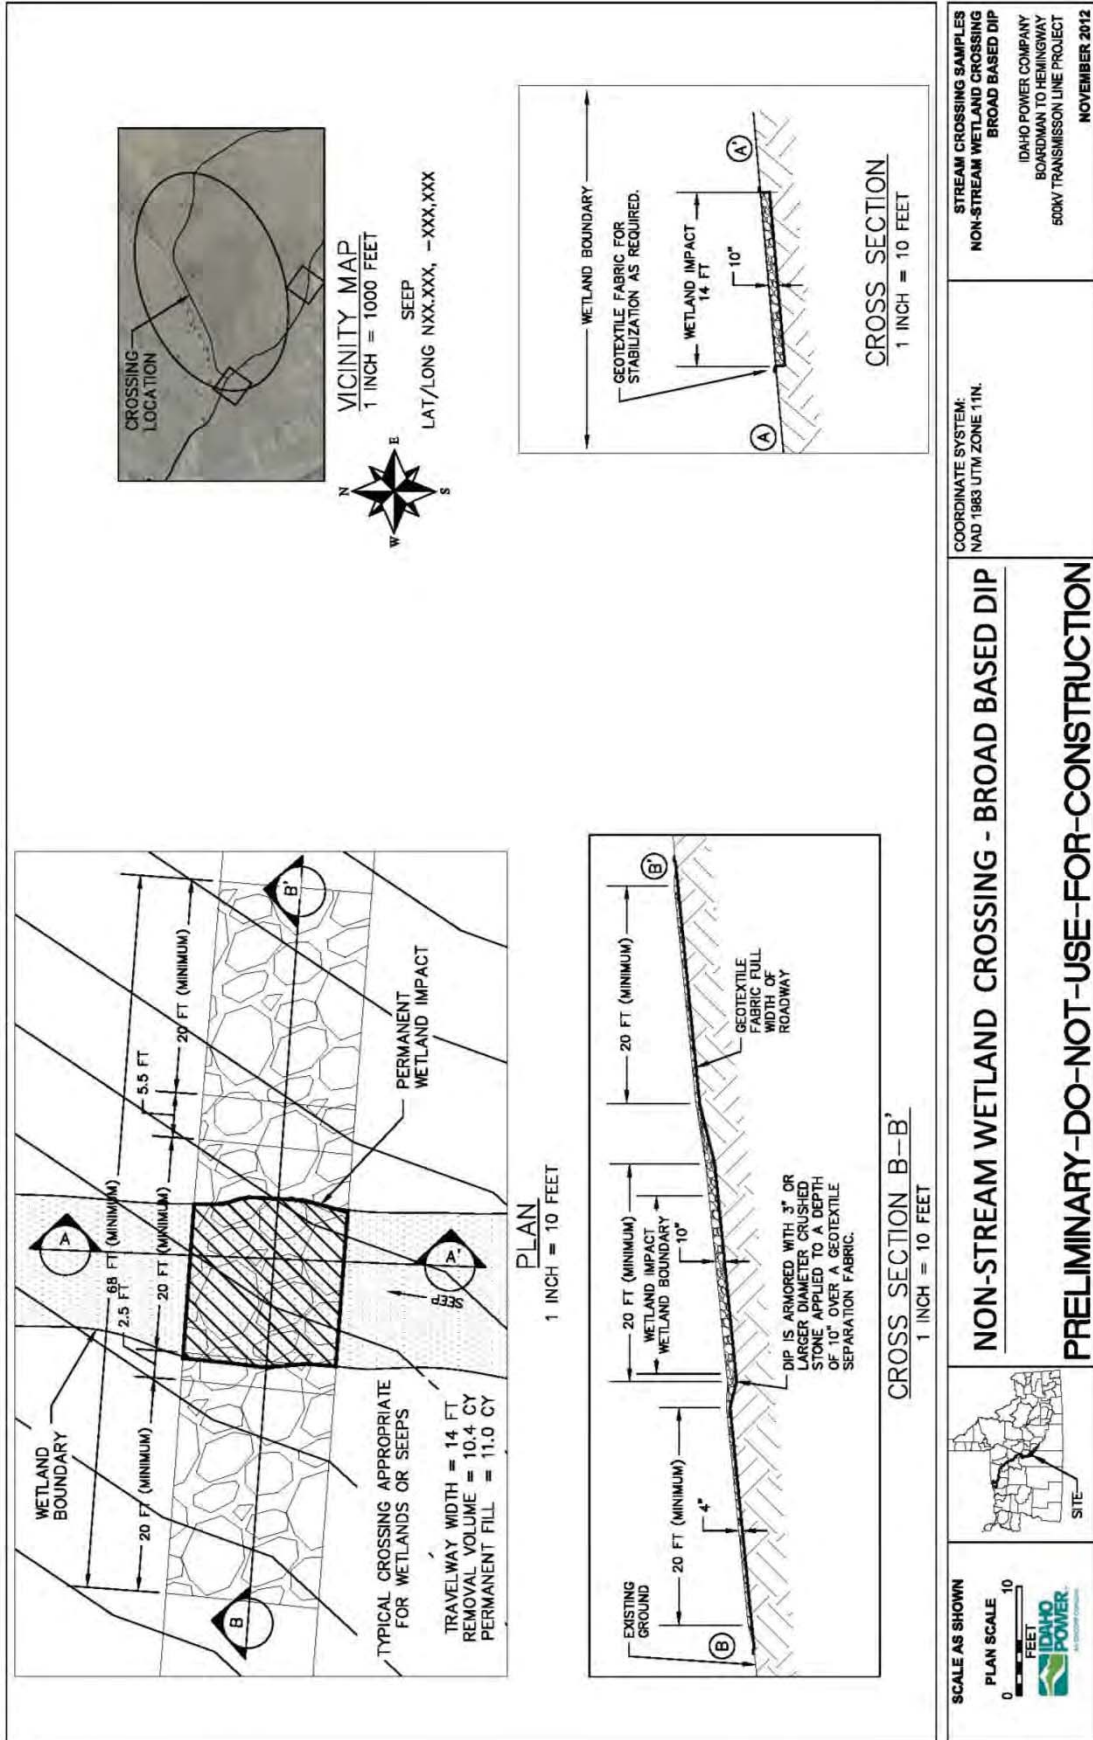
Typical Site Plan and Cross Sections: Non-stream Wetland Crossing
